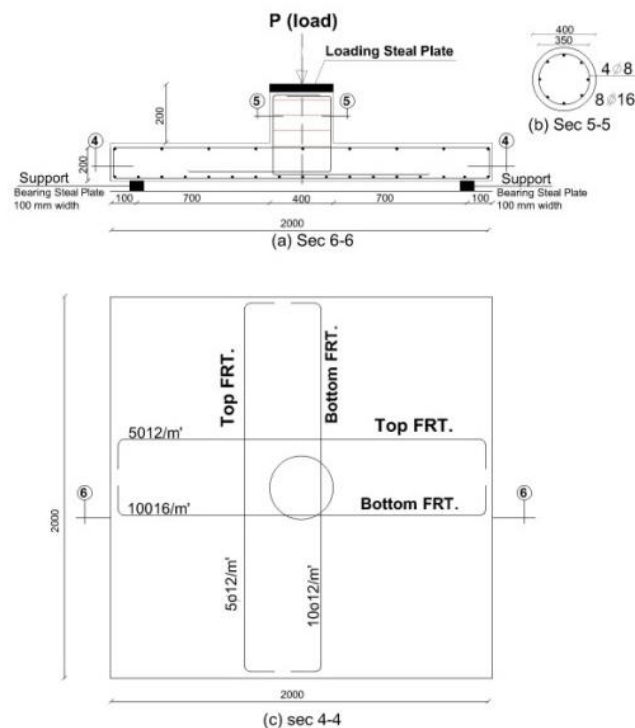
Geometry and reinforcement details of the parametric studied slabs.
